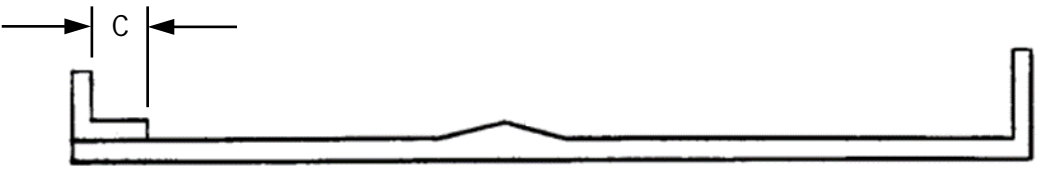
Cross-section view of a bridge deck with multiple median barriers.
